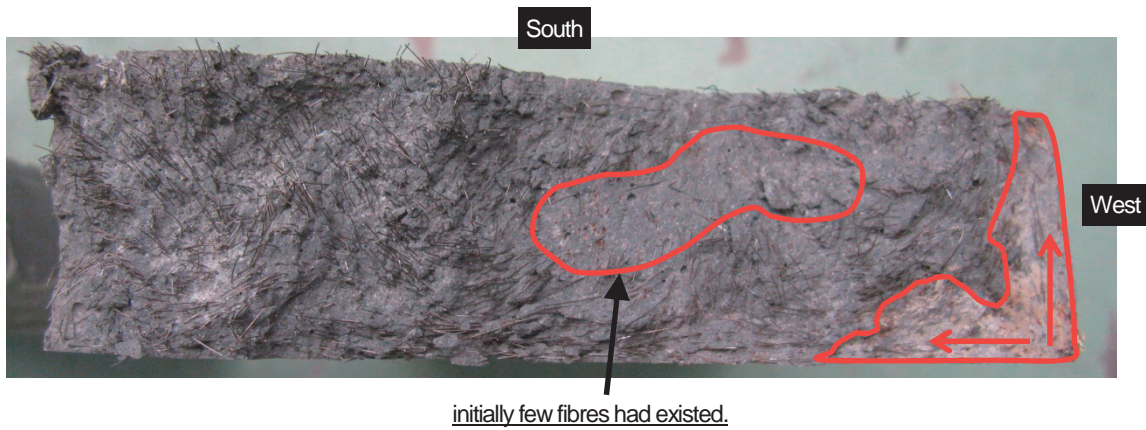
Fatigue fracture surface of S1-7 test specimen (lower half of the fractured specimen)
